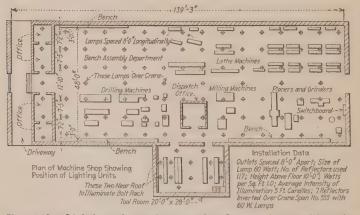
Lighting plan using metal reflectors for machine shop, College of Engineering, University of Illinois (National X-ray Reflector Company, Chicago, Ill.). See preceding illustration for sectional view of this shop.
